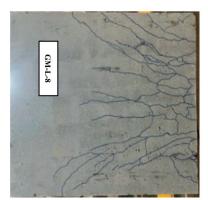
Cracking pattern on tension surface at ultimate load for slab GM-L-8
